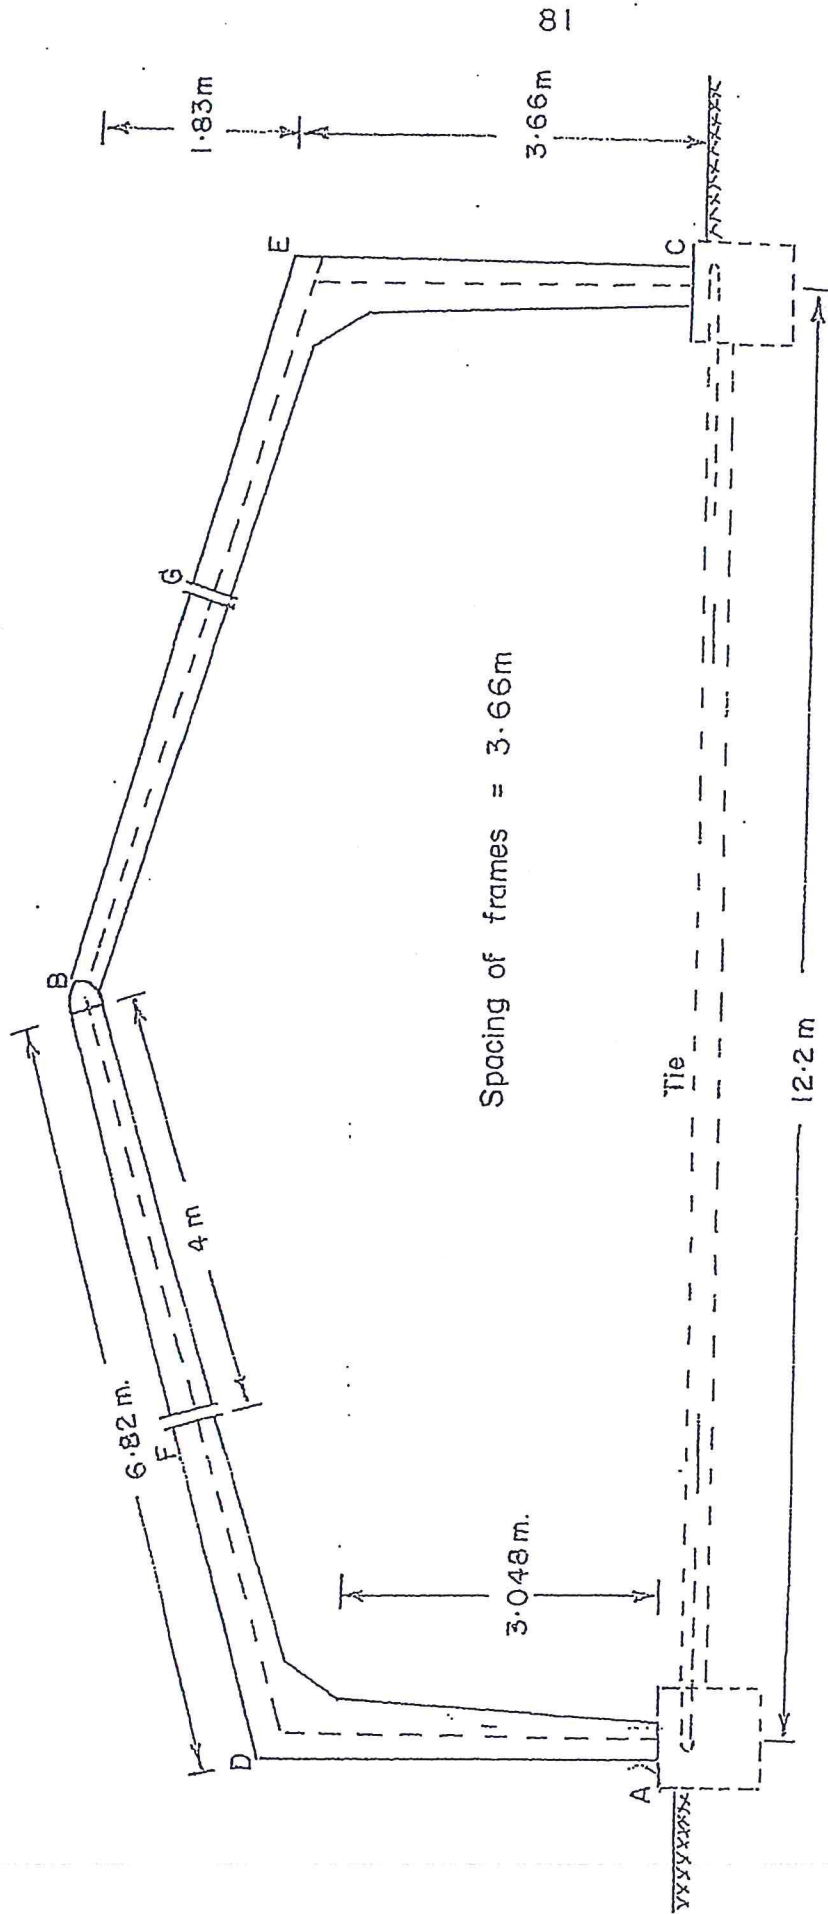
Precast Reinforced Concrete Frame For Industrial Sheds.
